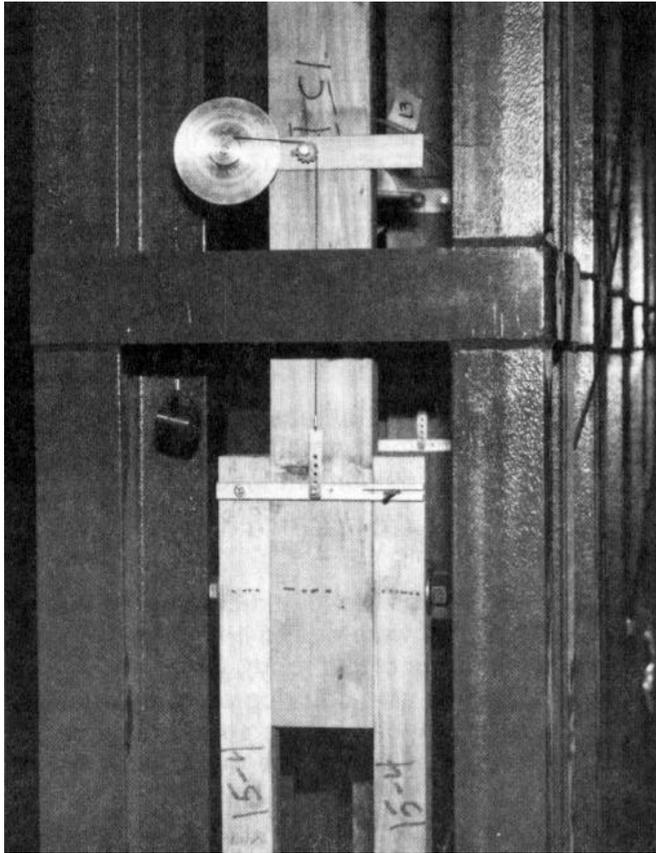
Method of measuring joint deformation during constant load test. (M86 0254-3)
